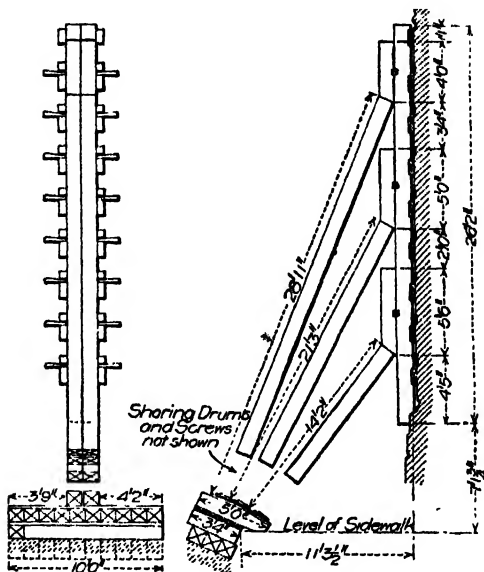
Showing Ashlar Face Wall of the Farmer's Loan & Trust Co.'s Building in New York City.
